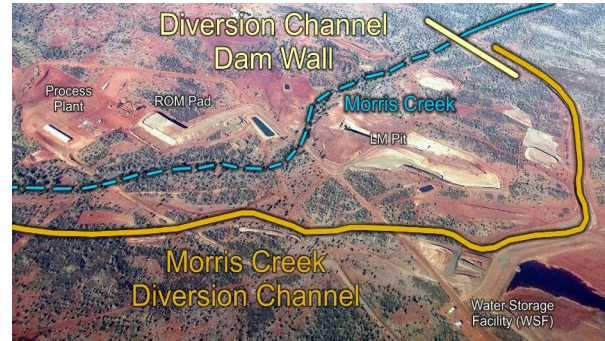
MCD channel and Dam Wall construction...see Figure 7 for location details
